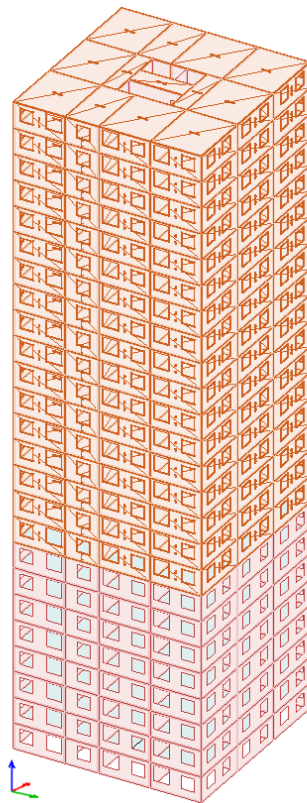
Hybrid timber building with a concrete core extending along the building's height and 8 storeys made entirely of concrete at the bottom.
